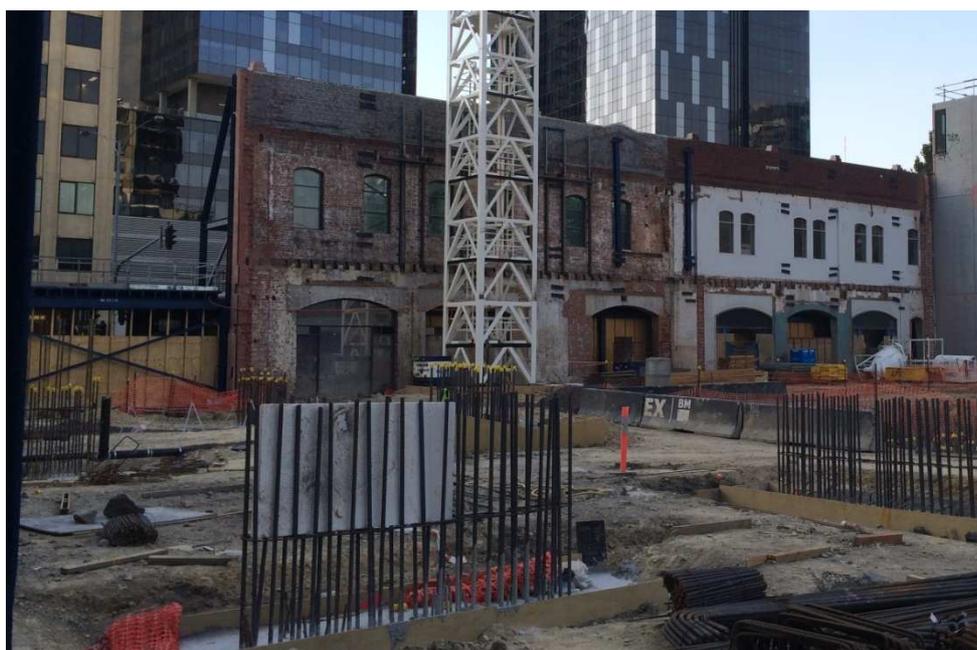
Internal building site relatively unencumbered by existing brick wall
